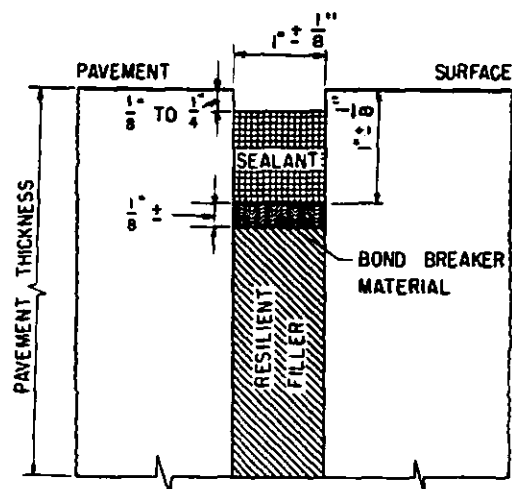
DETAILS OF JOINTS IN RIGID PAVEMENTS
